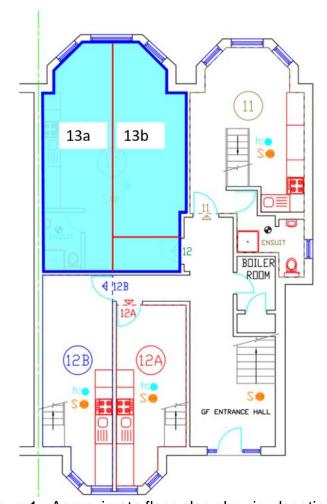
Approximate floor plan showing location of flats 13a and 13b. (Mezzanine level not depicted)
